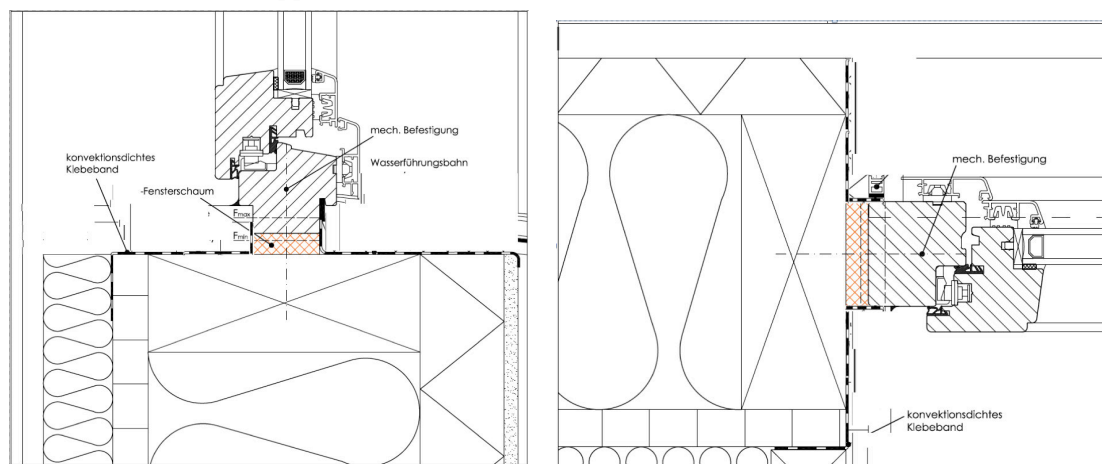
Section: Typical design of a window joint sealing – lightweight construction (ecowall)
